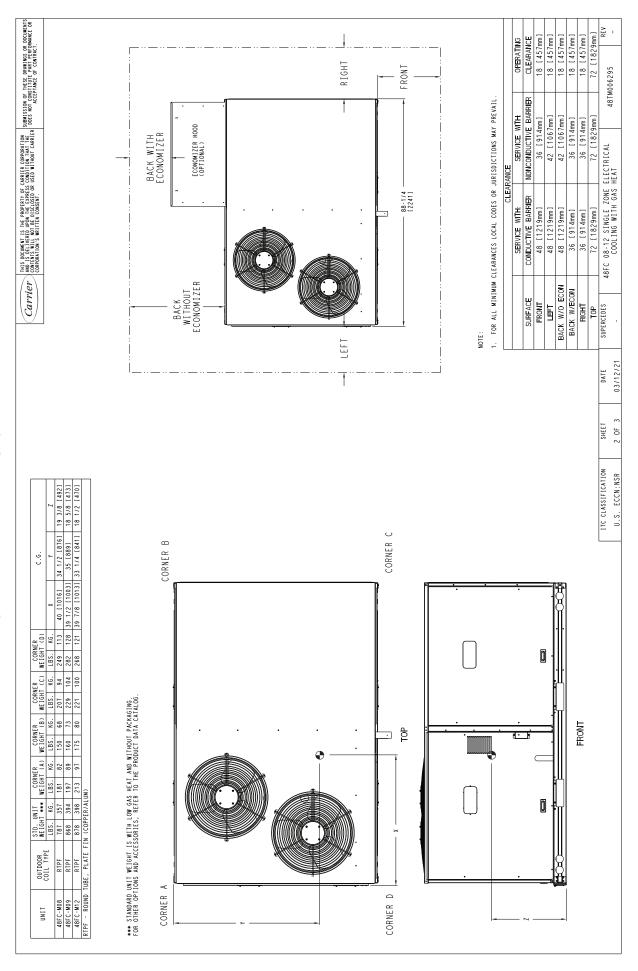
Unit Dimensional Drawing – Sizes 08, 09, 12 (cont)
